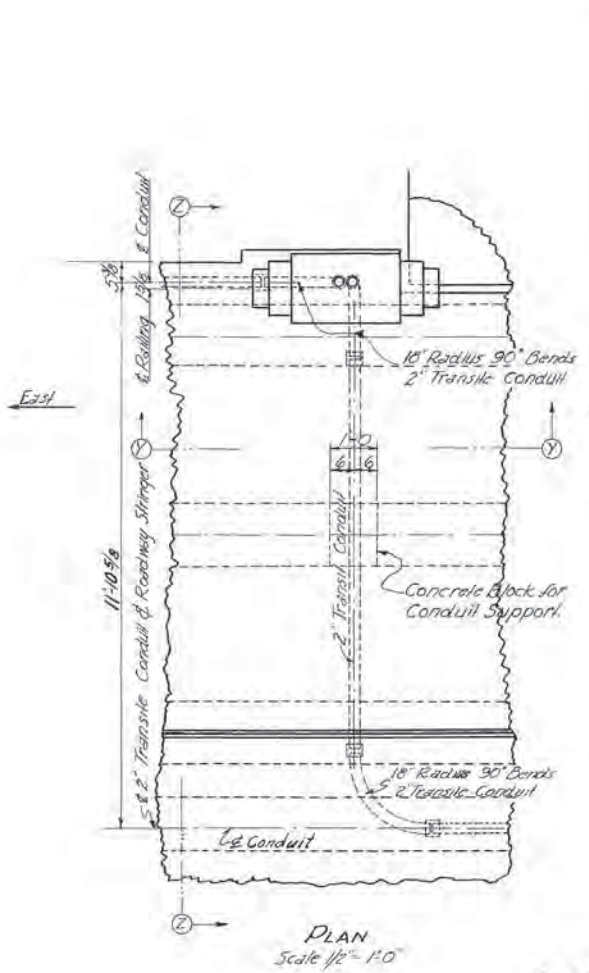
DETAILS TRANSITE CONDUIT IN POSTS L₁ & L₂ AND AT BENT No. 2 & 17
